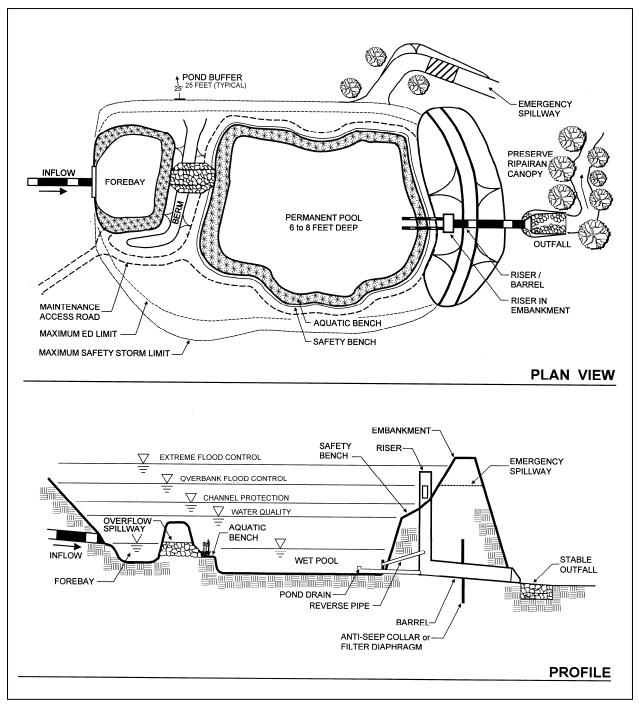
Schematic of a Typical Wet Extended Detention Pond (Source: Center for Watershed Protection)
